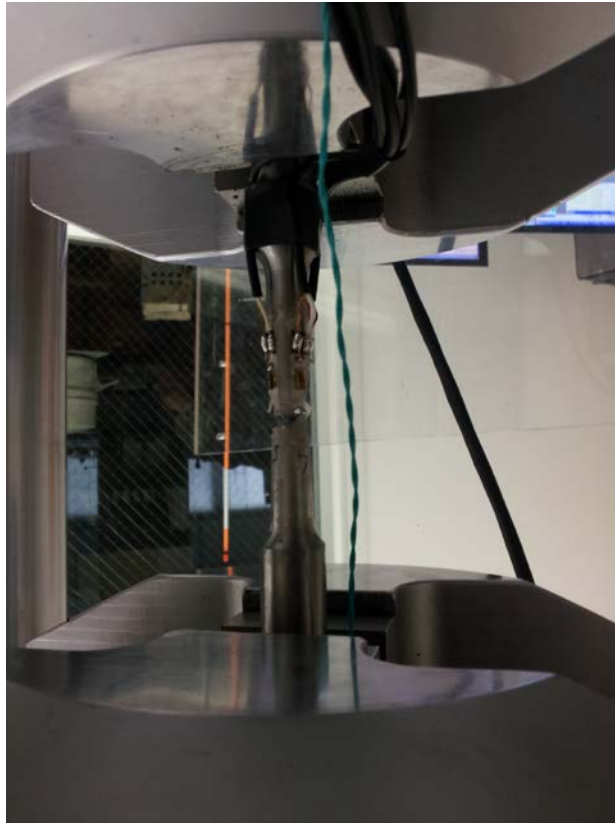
Anchor Rod Calibration in Universal Testing Machine
